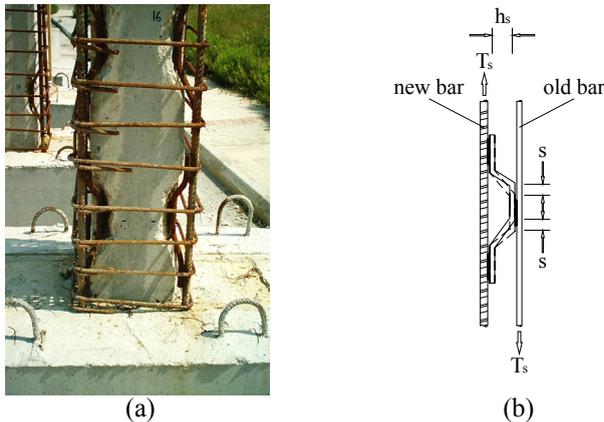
(a) Use of bent bars in concrete jackets, (b) bent bar model.
